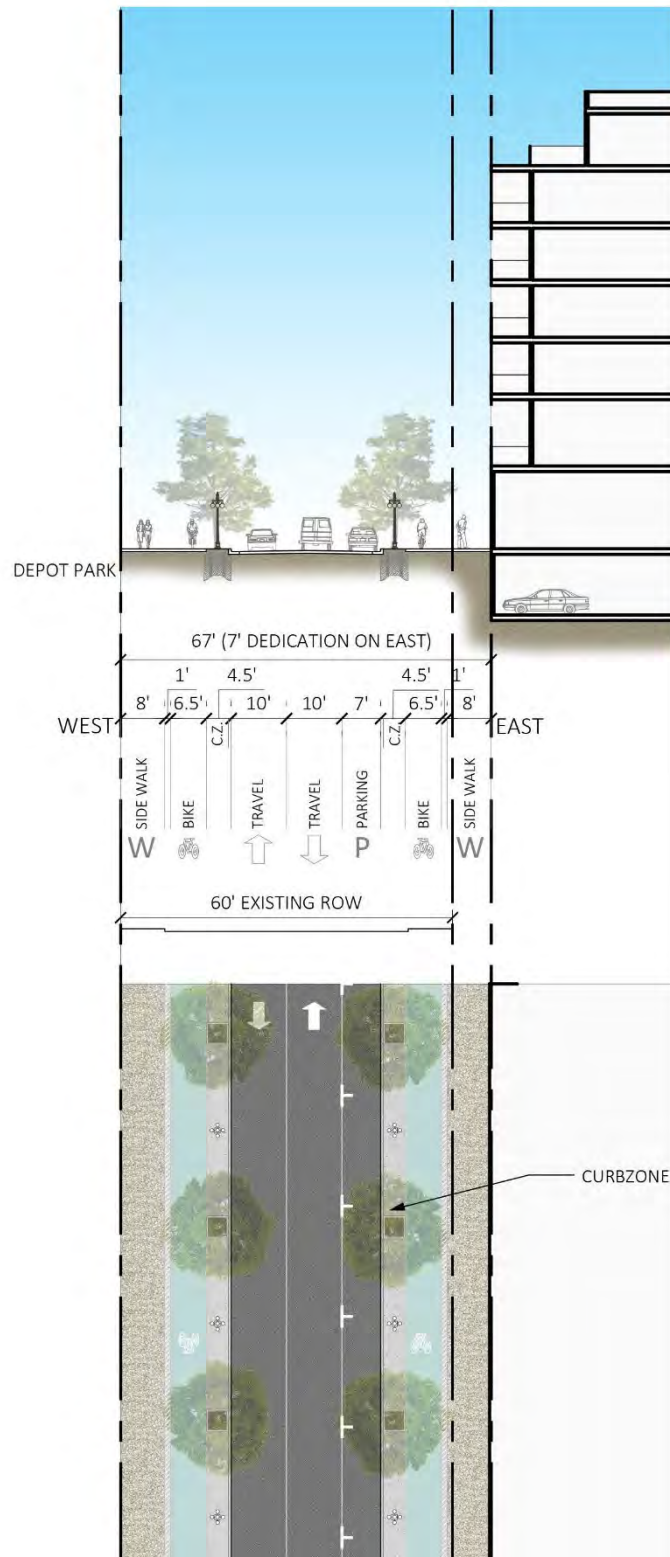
Pacific Avenue South of Laurel Street (7)
